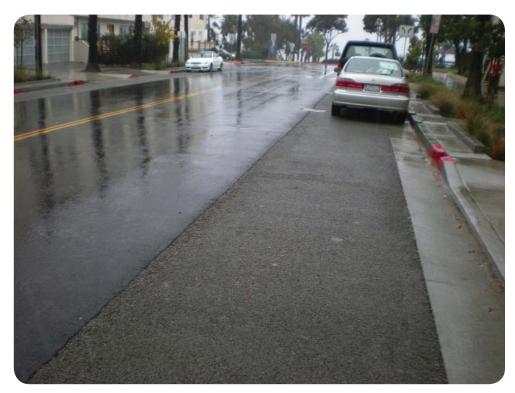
Permeable concrete after a rain event (Neil Shapiro)
